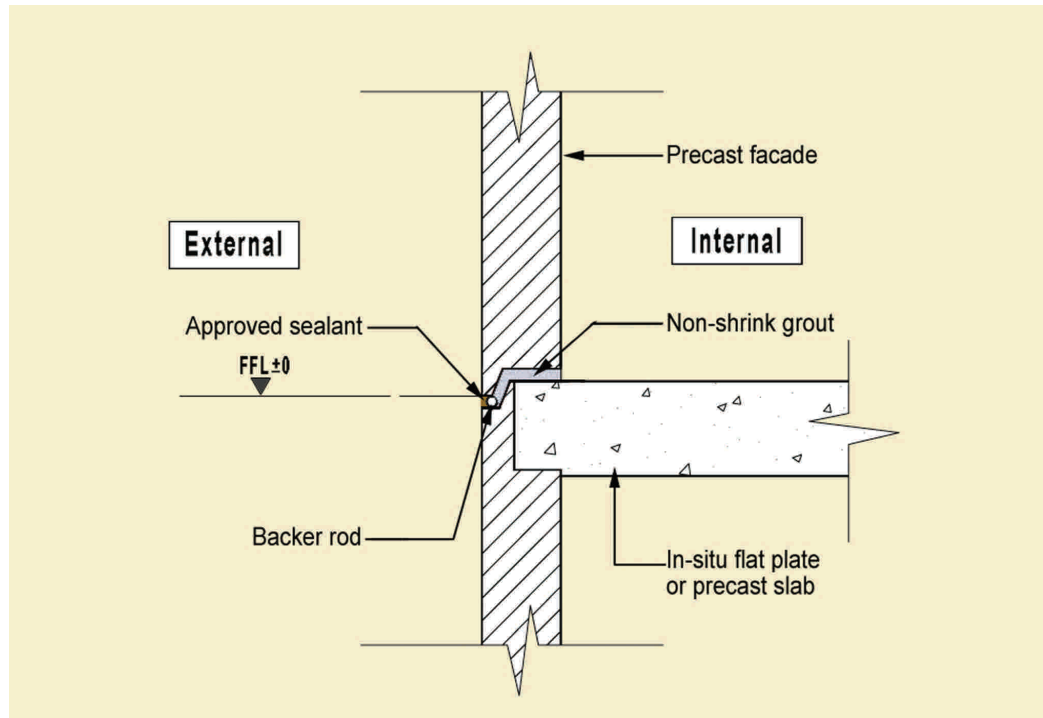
Horizontal joints between precast façade and floor elements
